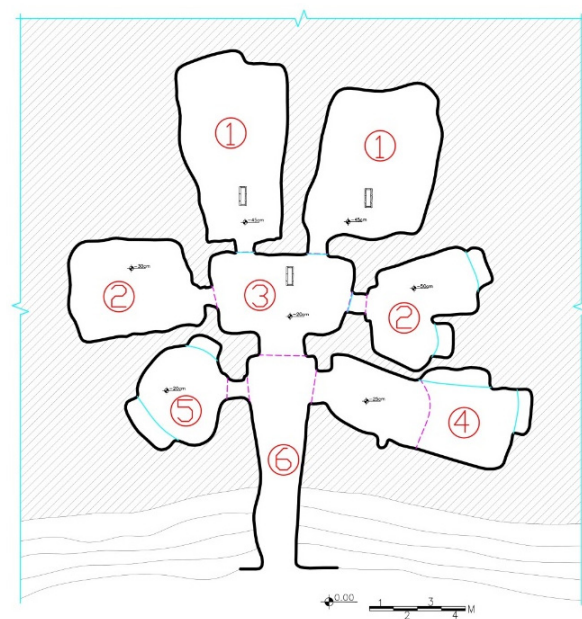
The fourth-stage fulfillment of excavation of rooms in cross—section and plan view.
